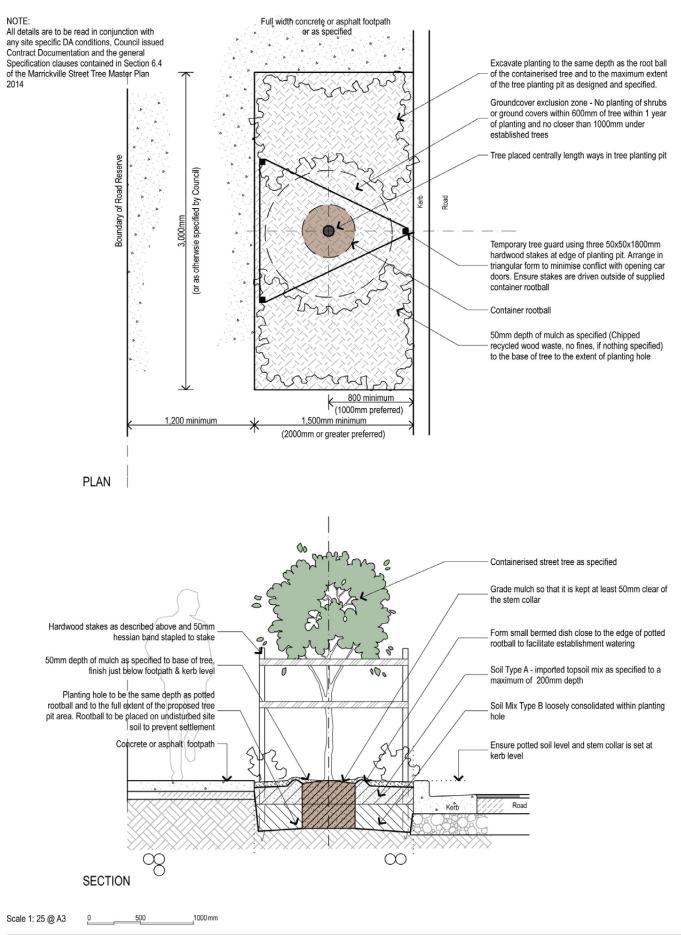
TREE PLANTING IN FULLY PAVED VERGE AND GOOD SURROUNDING SUBSOIL
